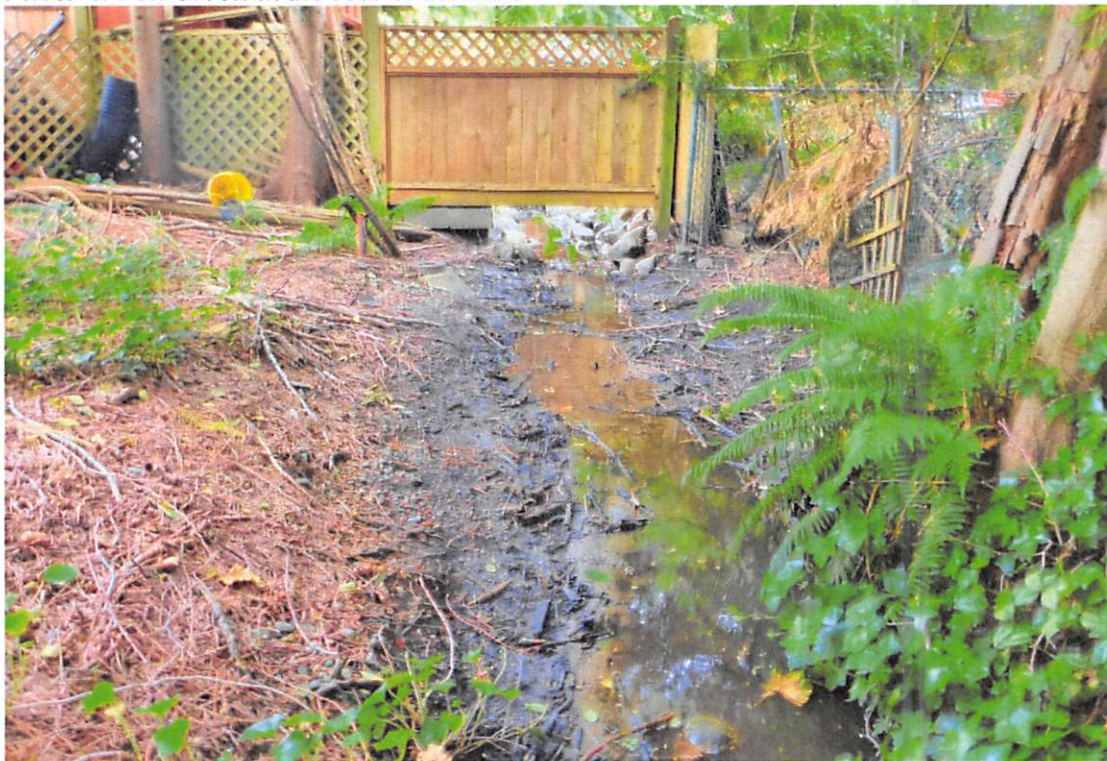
Slope and rip-rapped slope up to unopened road RoW.
